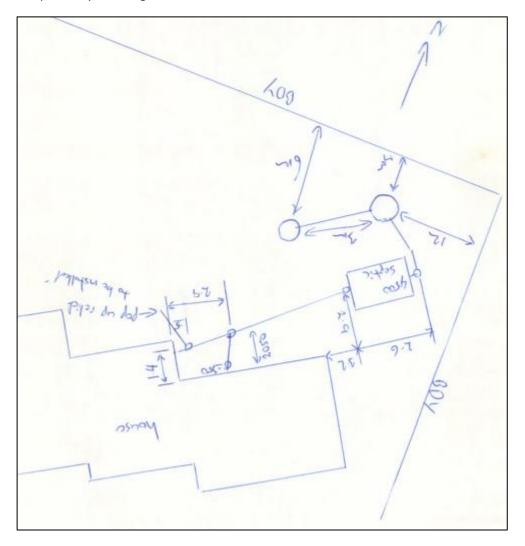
'As laid drainage plan' from BC-2005-1842-0
